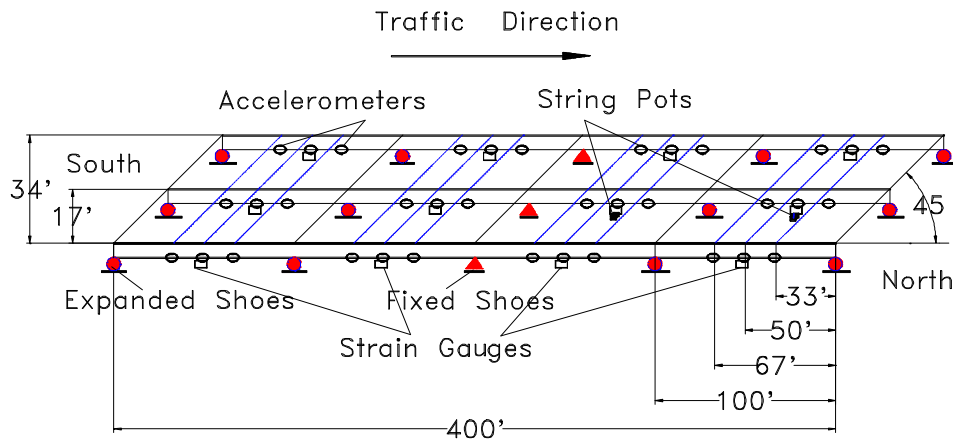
Sensors Layout on the Walnut Creek Bridge
